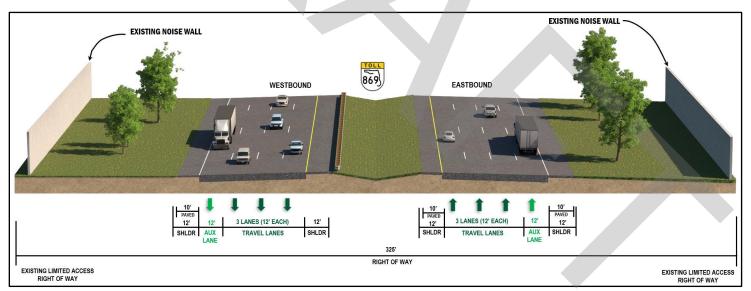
No-Build Alternative Sawgrass Expressway Roadway Section between US 441 and Lyons Road
